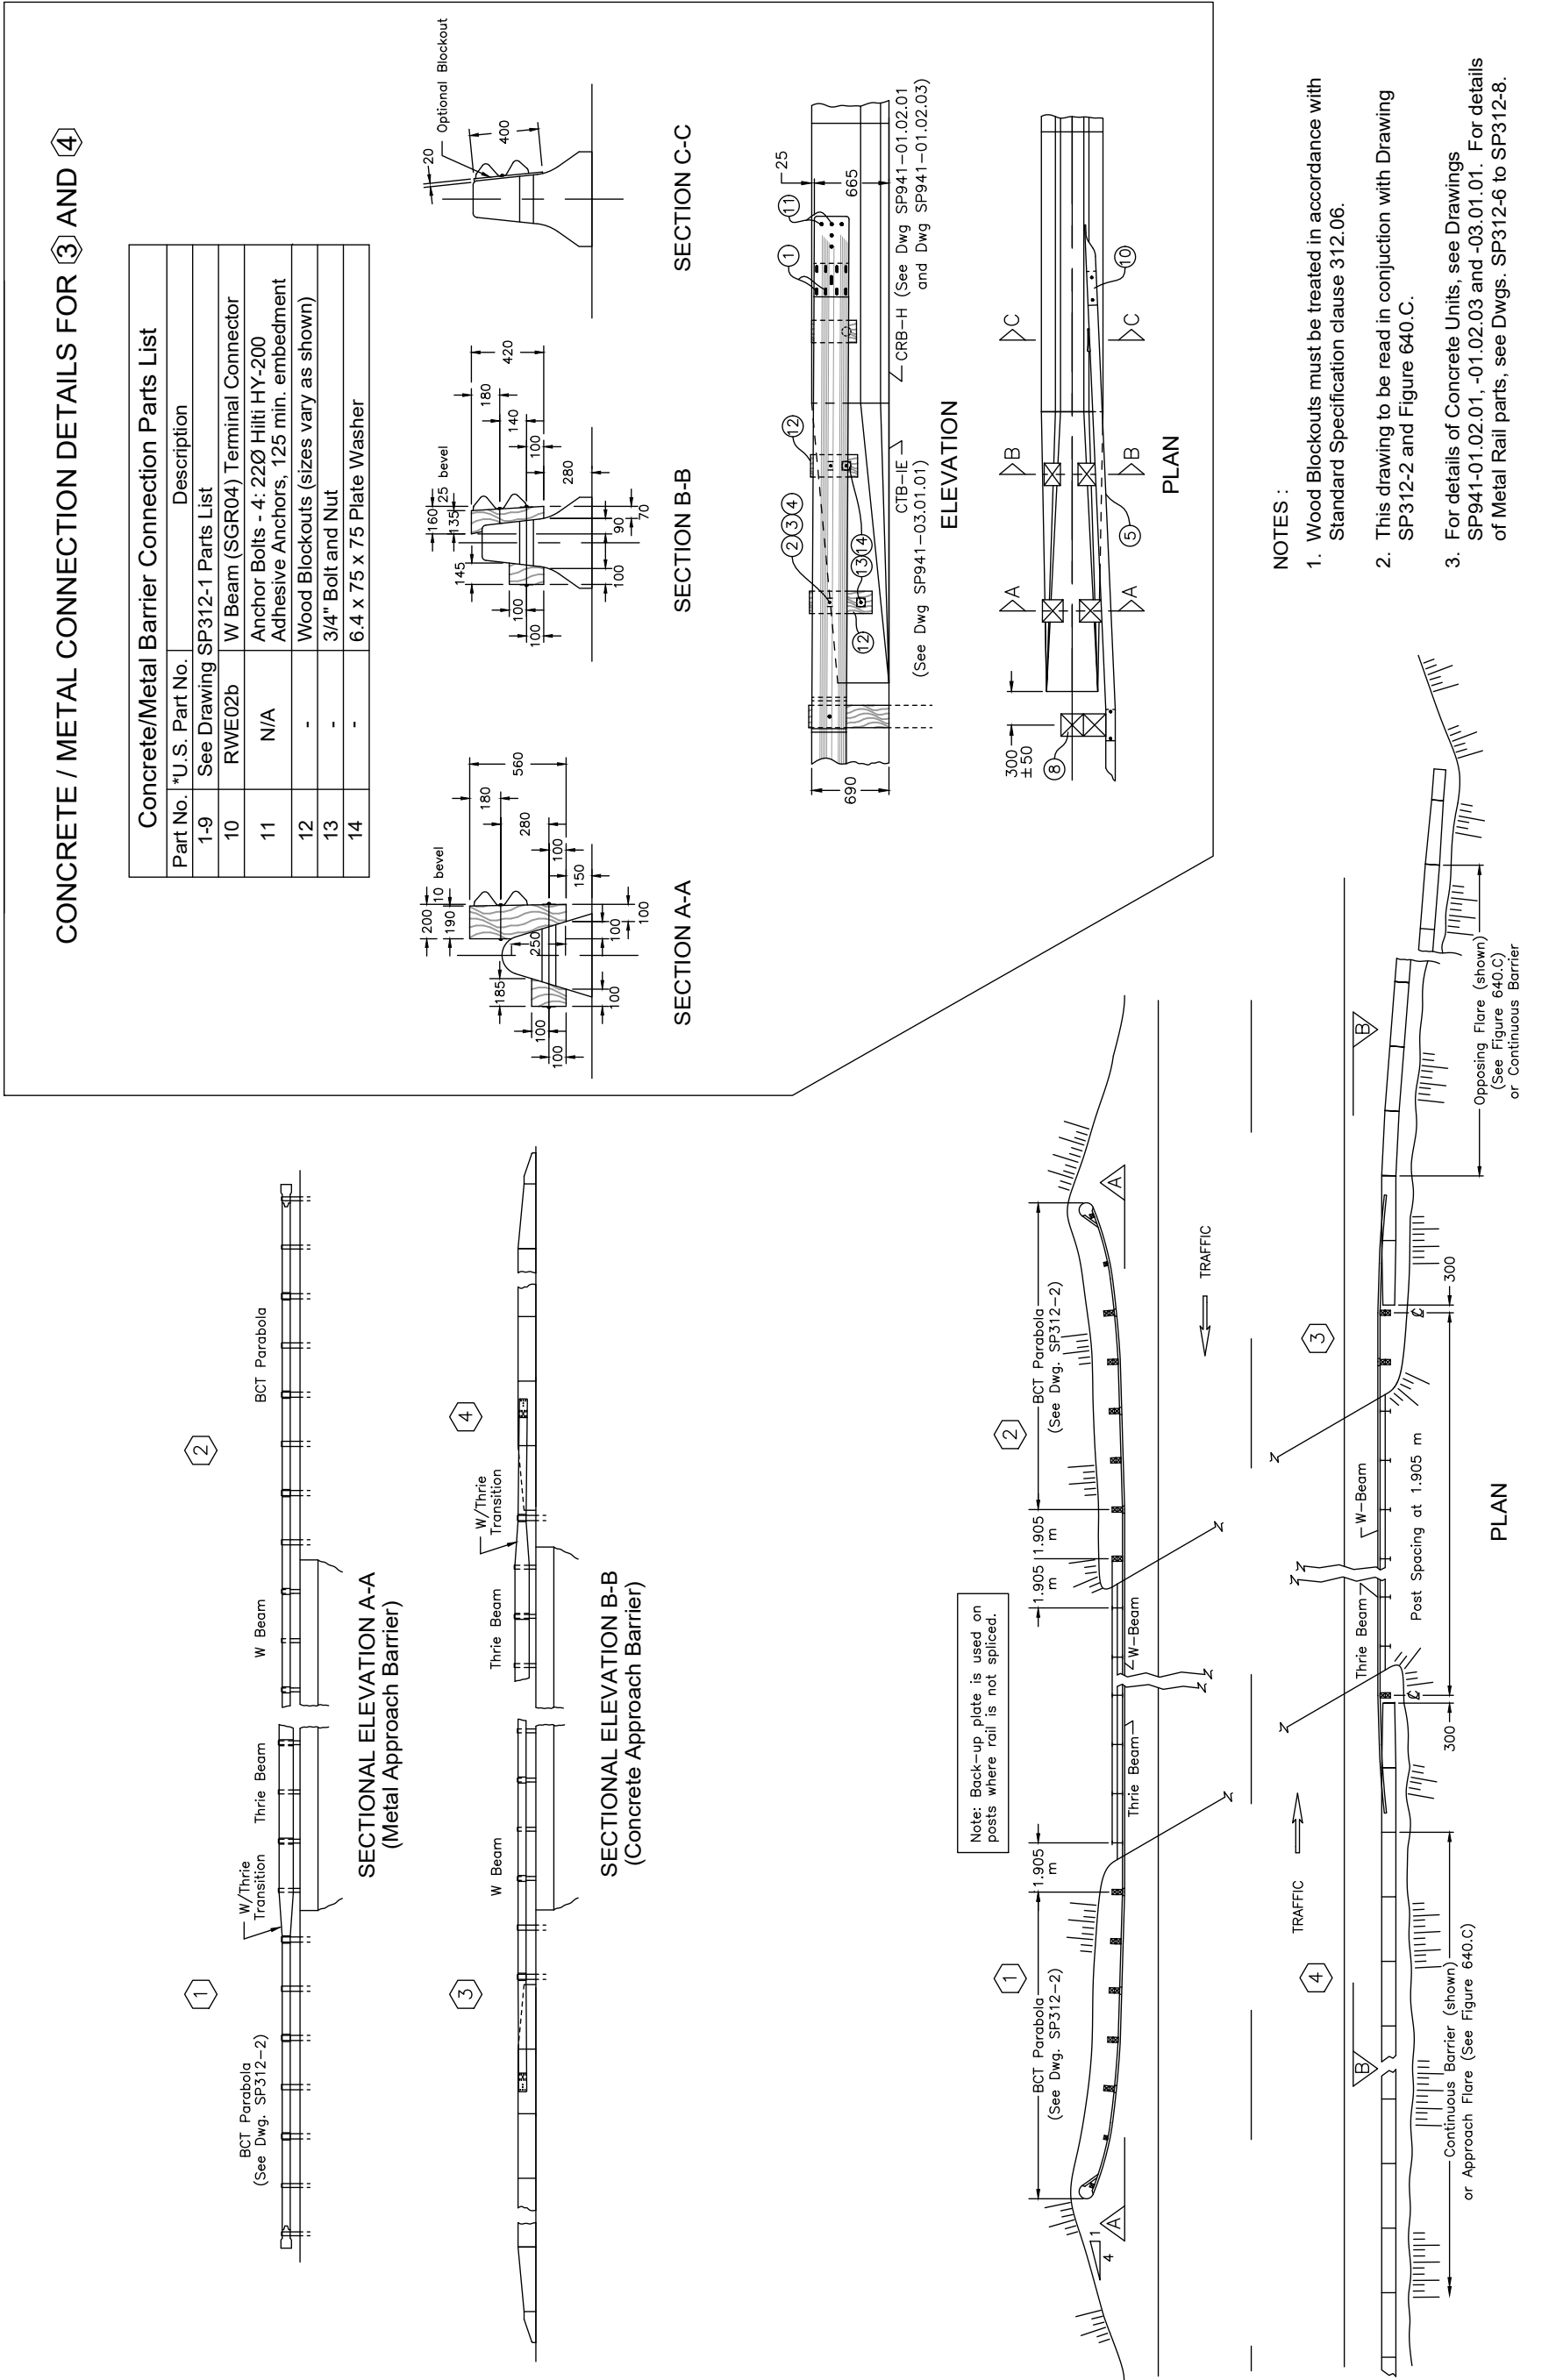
G Approach Barrier Layouts for Bridges with W-Beam and Thrie Beam Barrier
